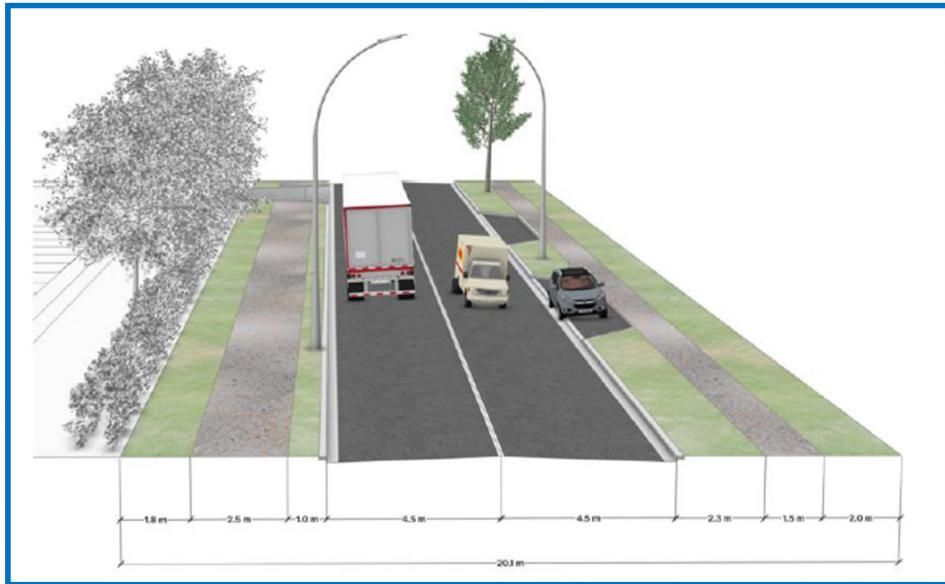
e: Indicative Old Ruffell Road upgrade cross section (Collector)
